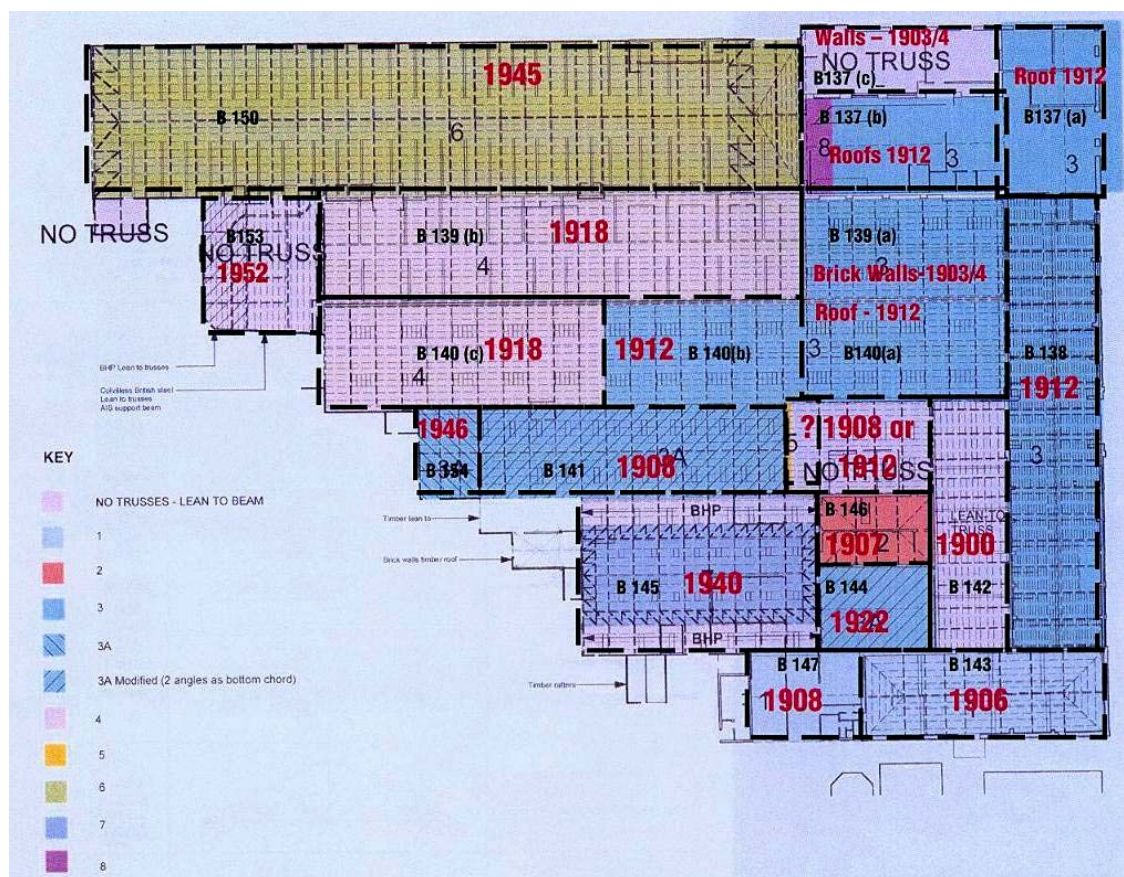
Building Construction Date Plan (based on drawing by Design 5 Architects).
